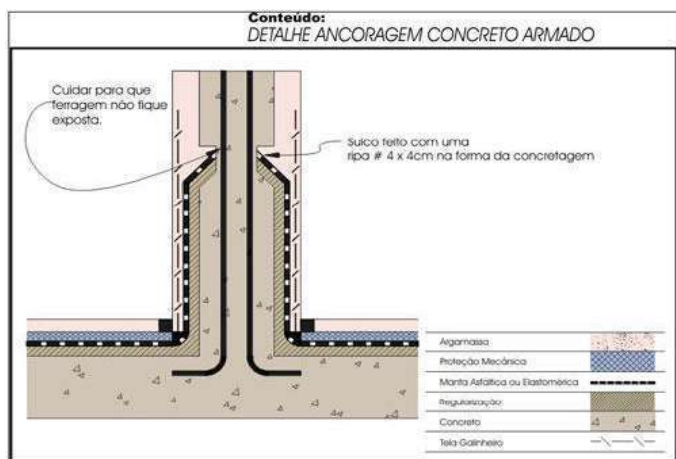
Detail Reinforced Concrete Anchor with waterproofing.
